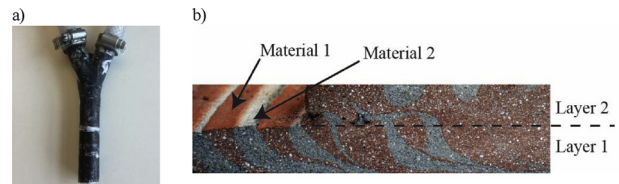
a) Y shape nozzle, and b) cross-section of a printed 2 material specimen printed with the Y shape nozzle.
